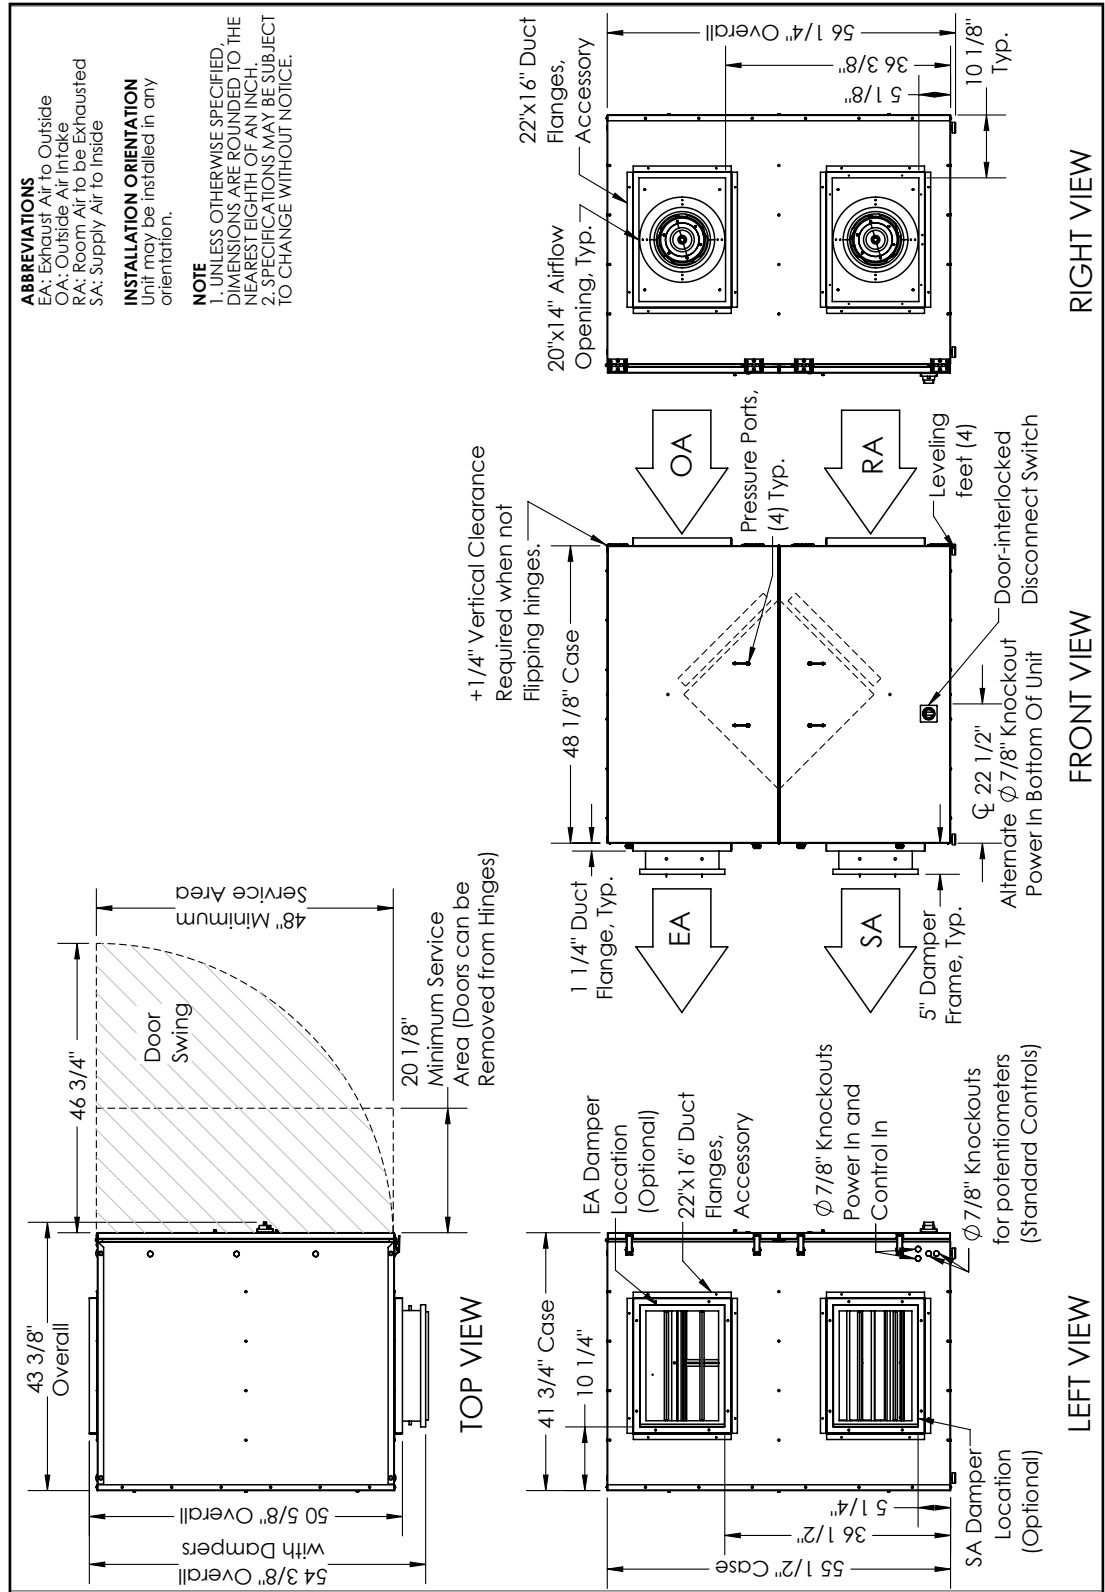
HE15INH DIMENSION DRAWING (HORIZONTAL AIRFLOW ORIENTATION)
